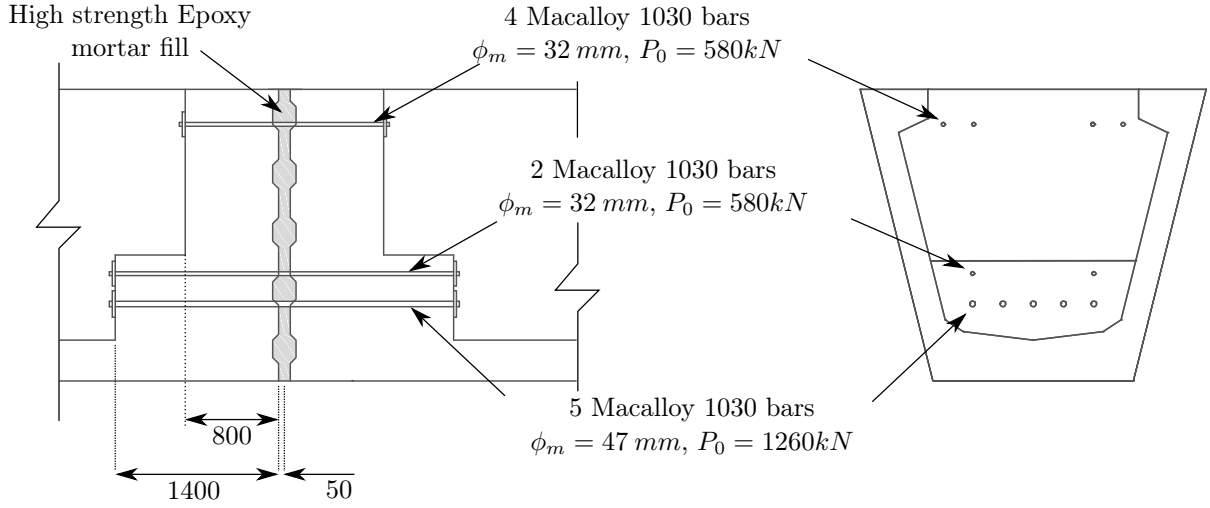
Detailed cross section of the diaphragms and the inter U-beam connection, with all dimensions in mm
